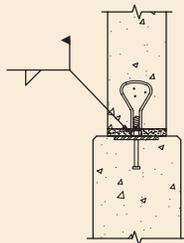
Bearing wall to foundation (BWF3).
